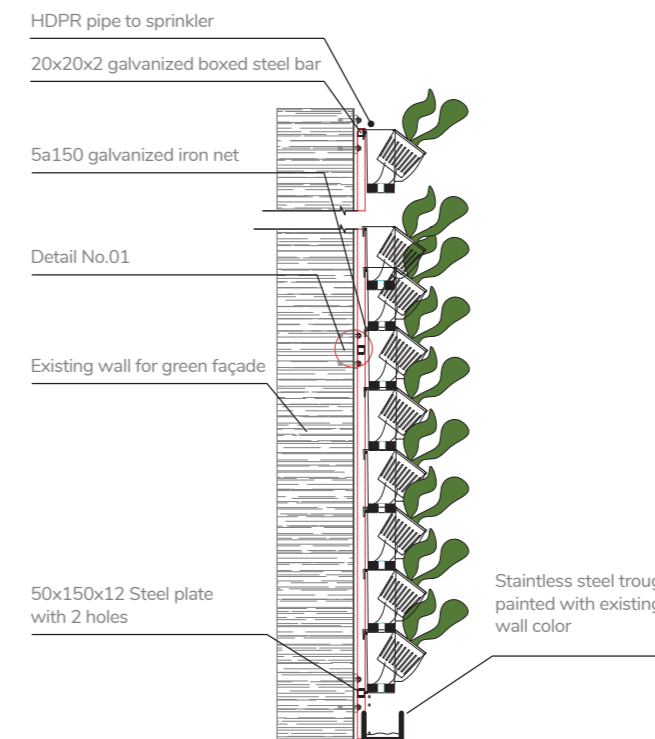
The wall system with stainless drainage drip tray at the bottom drainage layer
